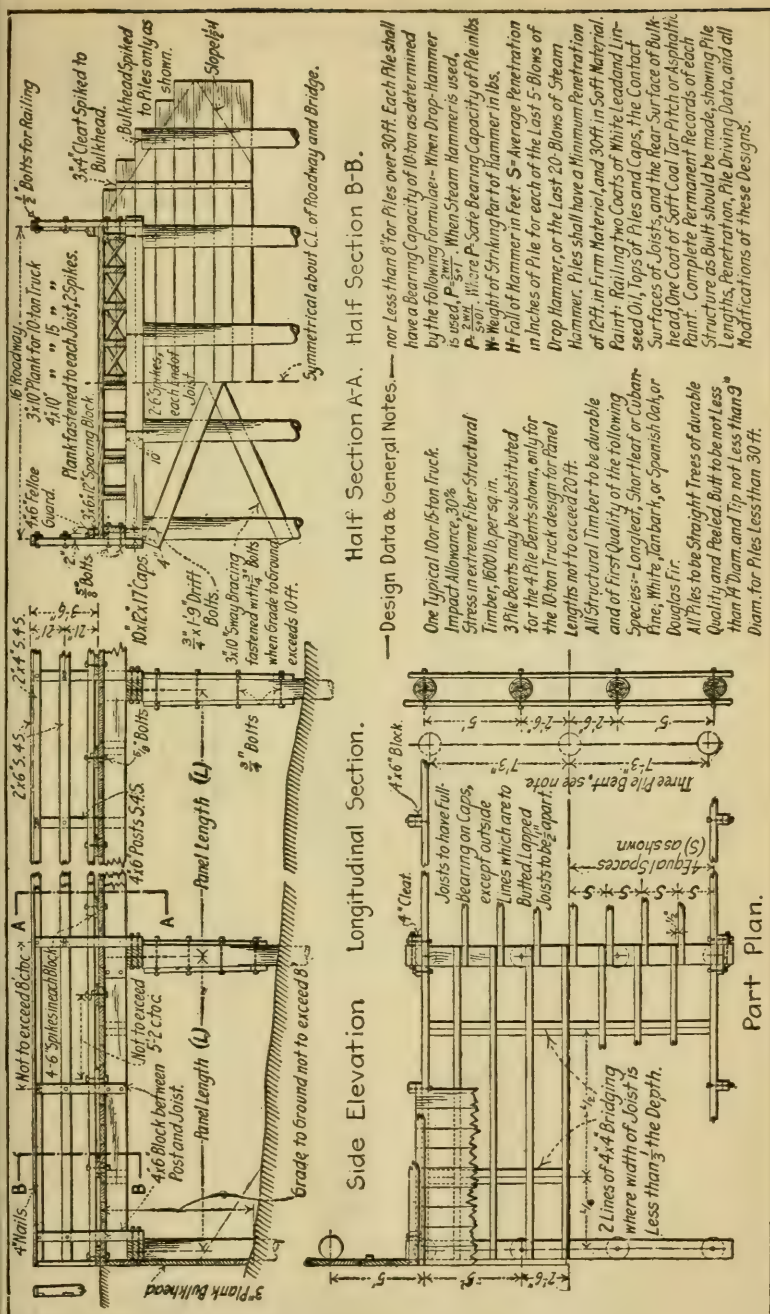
Typical pile trestle. U. S. office of public roads.
